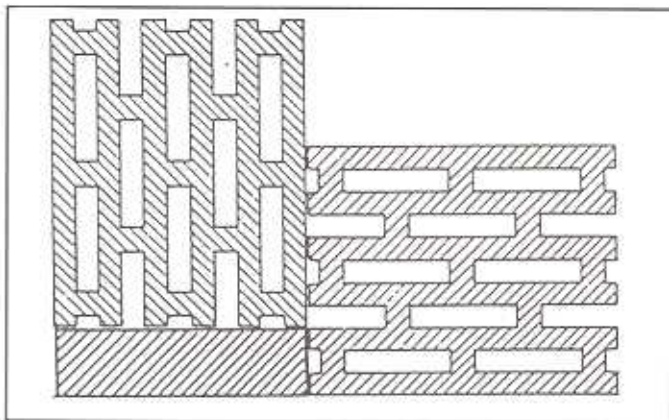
Detail of the corner of wall made of concrete hollow-blocks.
